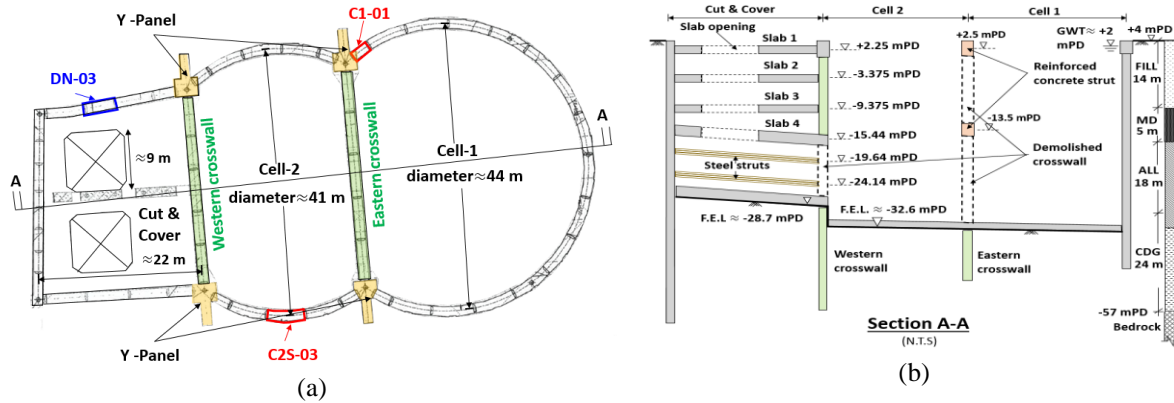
(a) General layout of the TBM launching area and (b) Cross section of the TBM launching area
